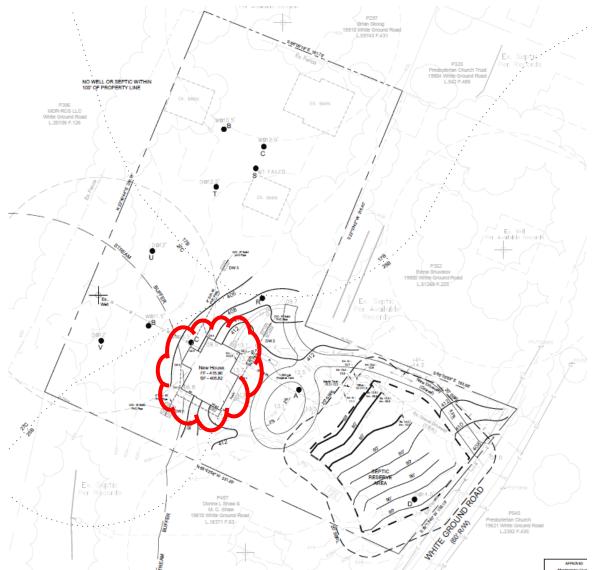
The approved site plan for the subject property. The proposed building is clouded in red, nearly 200 feet from the right of way.
